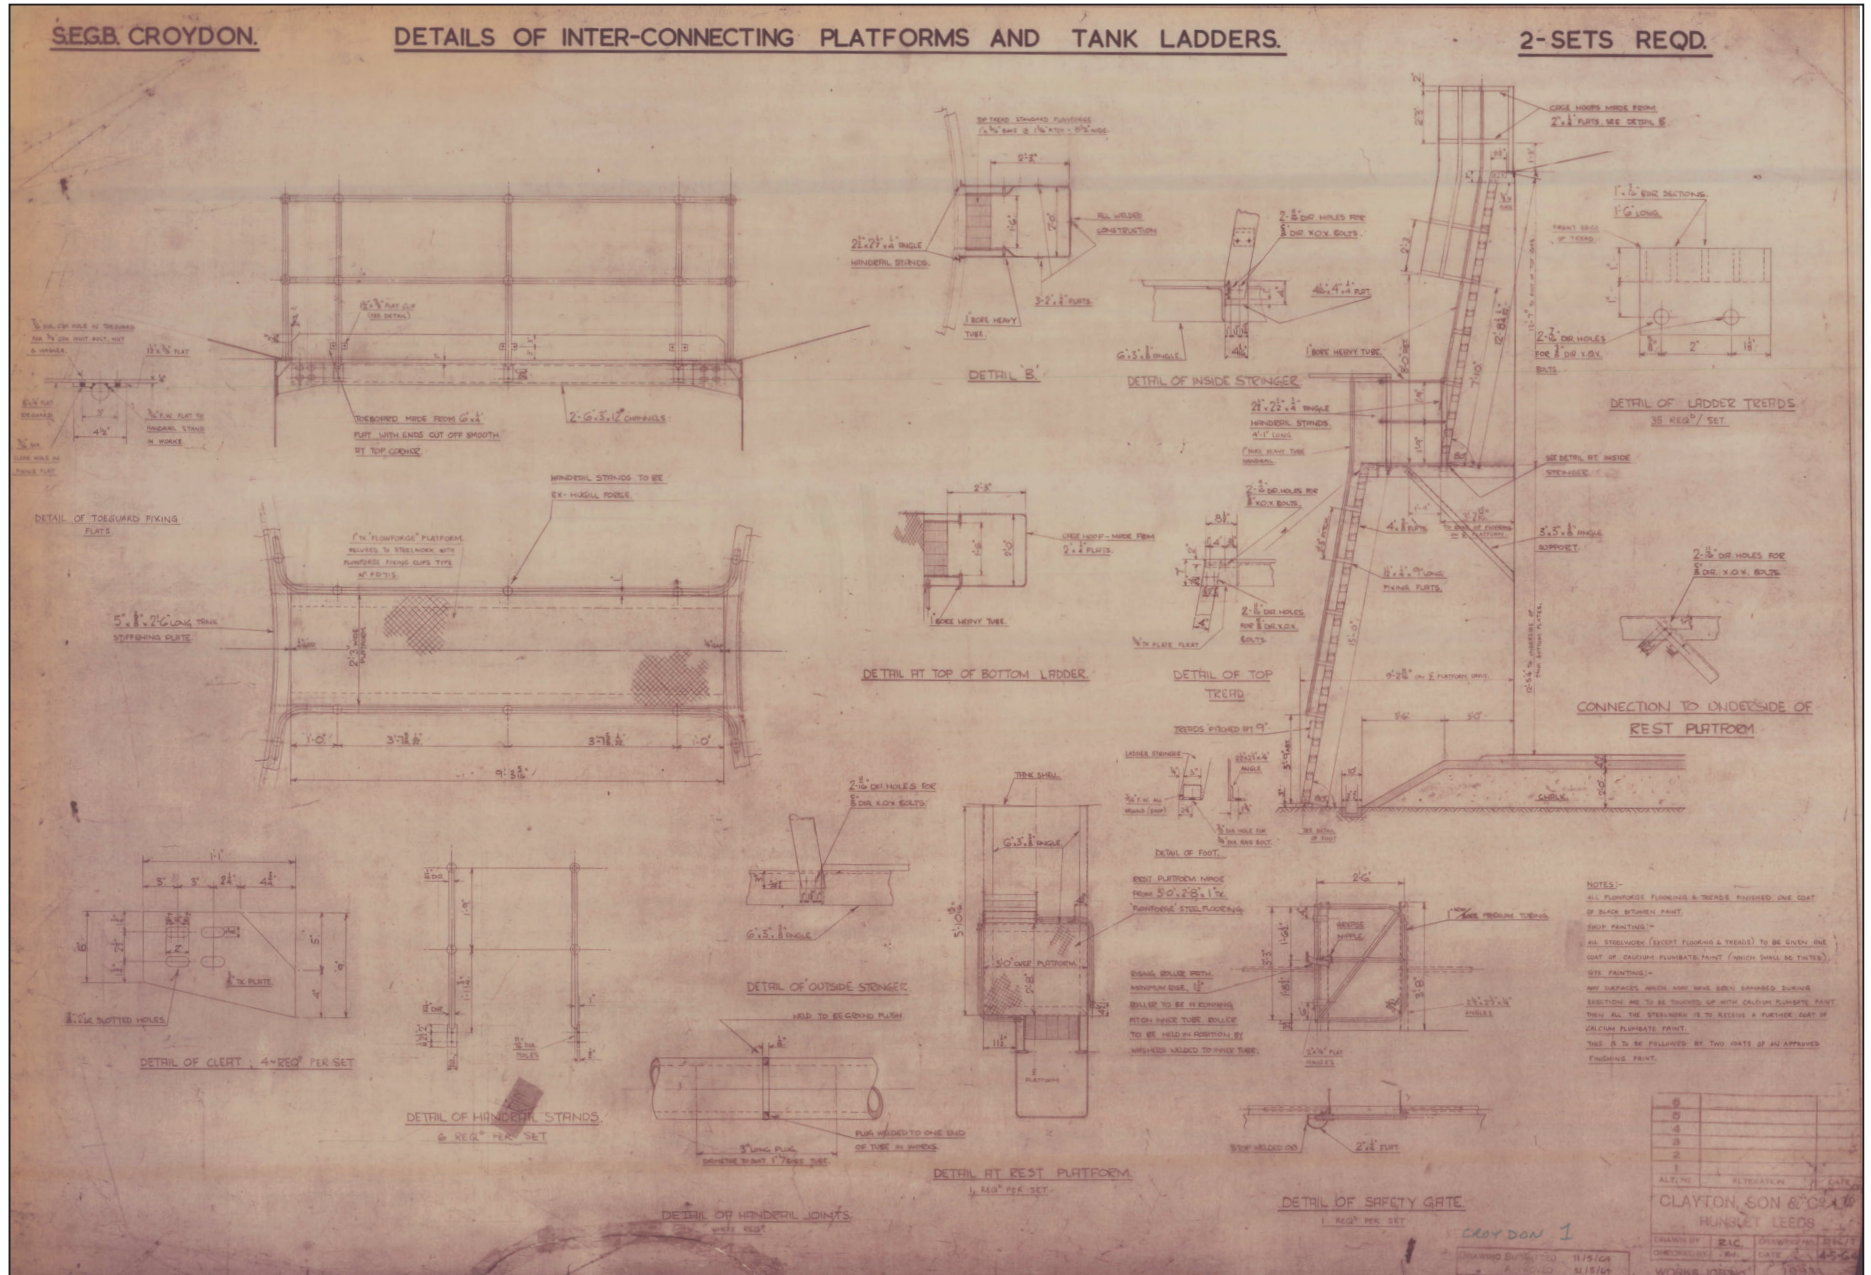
Archive Plan of Connecting Platforms and Tank Ladders for Gasholder No 4, 1964 (NGA Ref: SE_CRD_E_T_11)
